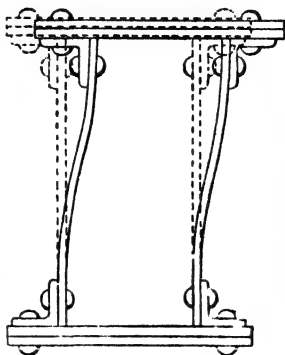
Cross-section of Box Girder without Diaphragms.
